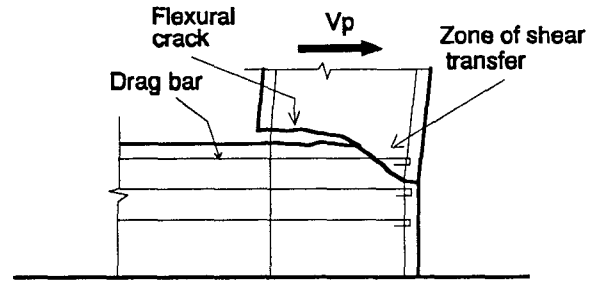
Shear transfer mechanism between pier and wall at base.
